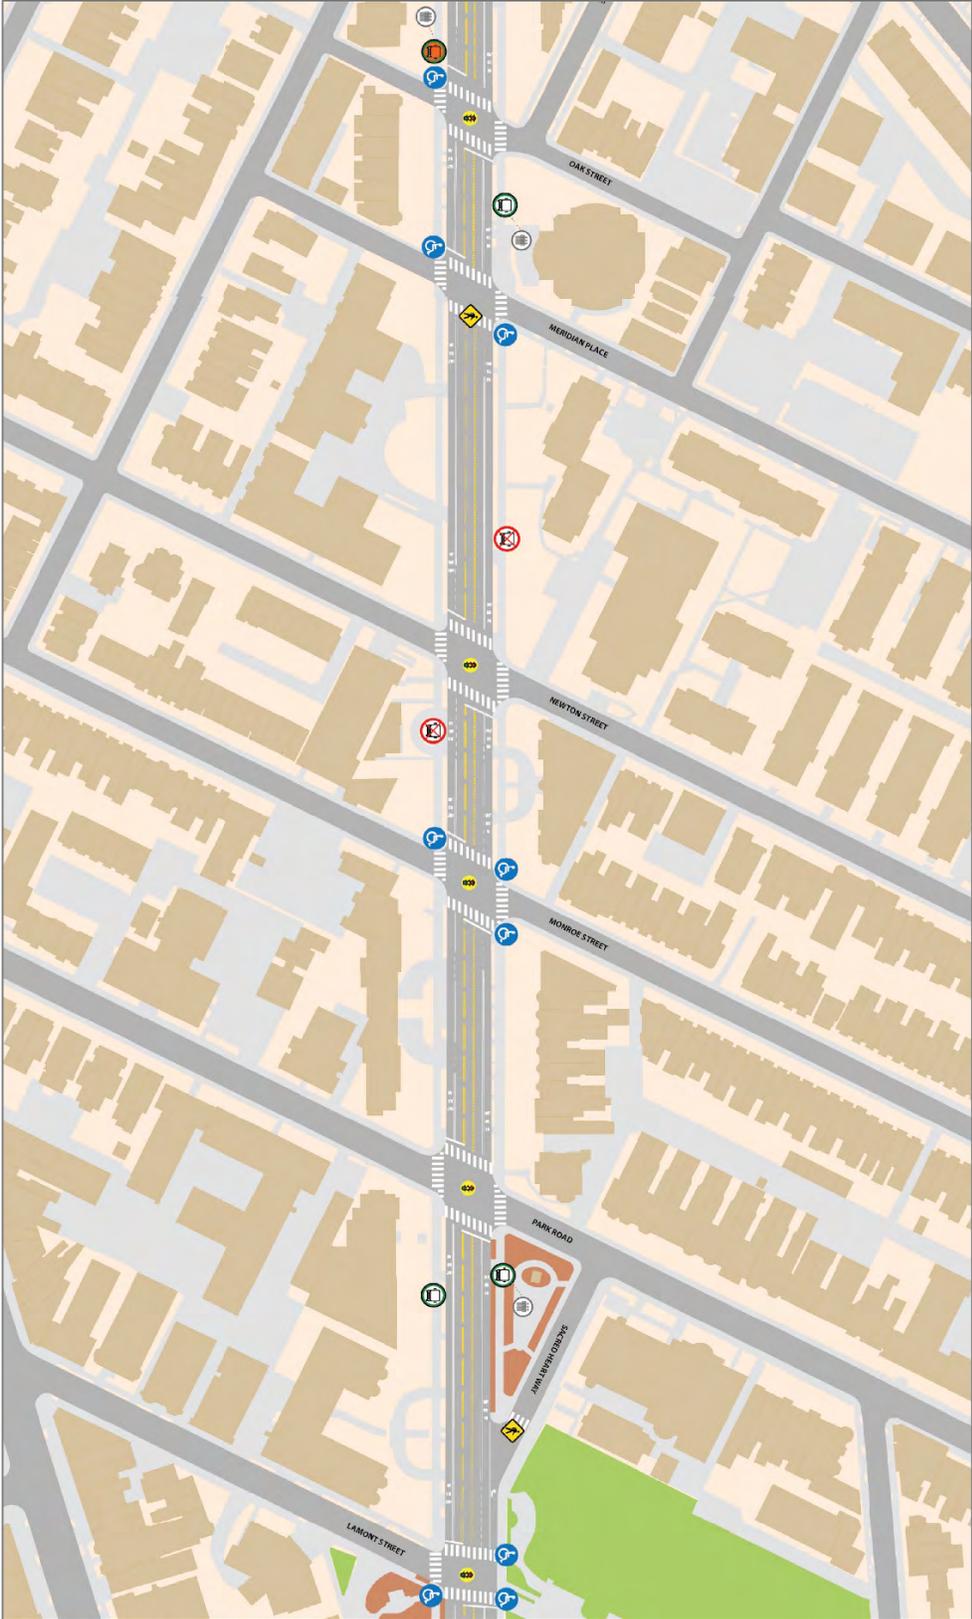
Recommended Improvements – Lamont Street NW to Fuller Street NW
